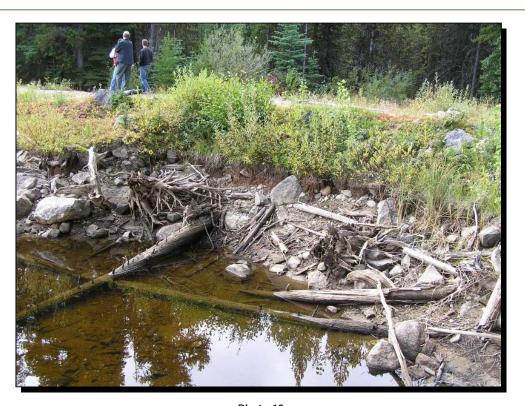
Big Meadow Lake Dam — Erosion of upstream face and accumulation of debris adjacent to right abutment
